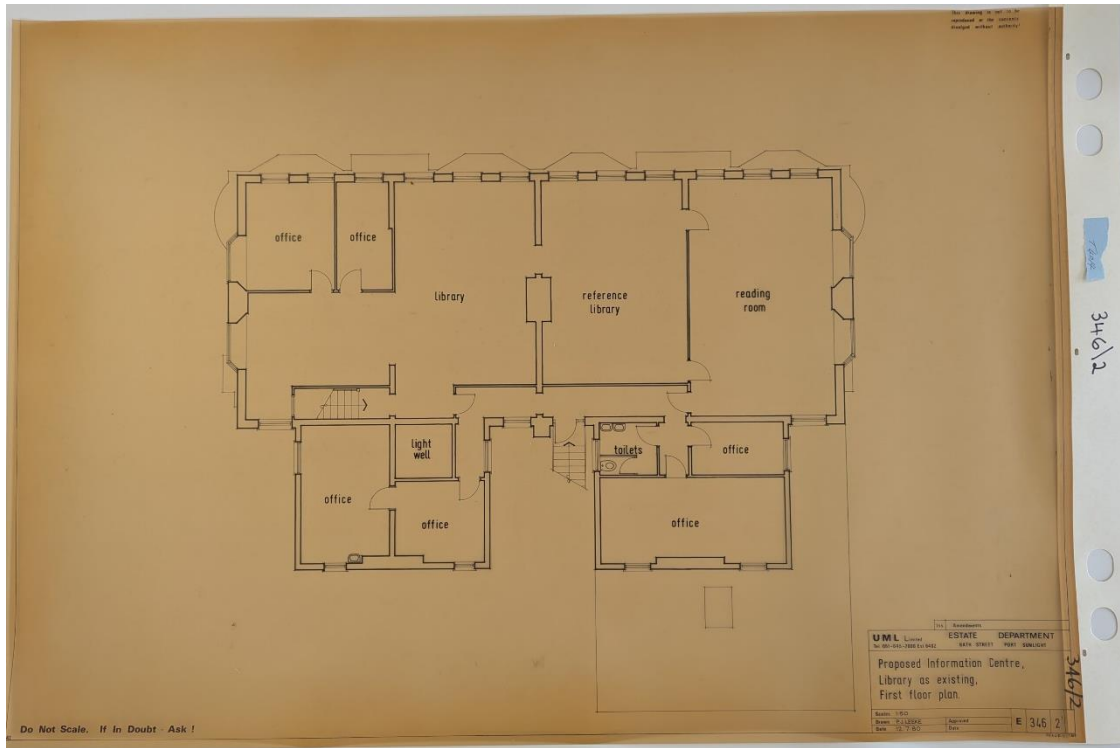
First floor existing conditions plans, 1980. Created by UML Estate Department ahead of the adaptive use of the spaces at 93-96 Greendale Road for the Heritage Centre. This drawing is held in the collections of Port Sunlight Village Trust, Accession Number 346/2.
